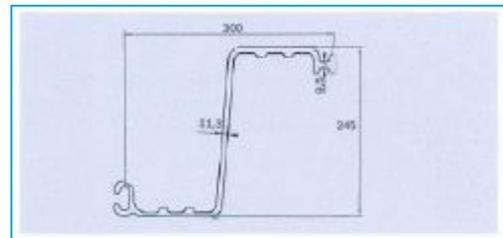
Example of a connection profile [Bergschenhoek, 2016]
